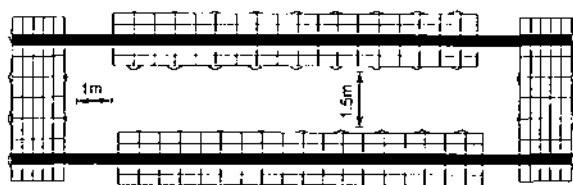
Placing of main beams along the length of the Hesco Bastion. 250mm wooden beams could also be used.
